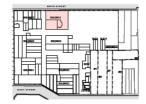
Plan showing parts of Building 8 and location on the site, TZG, 2014.
